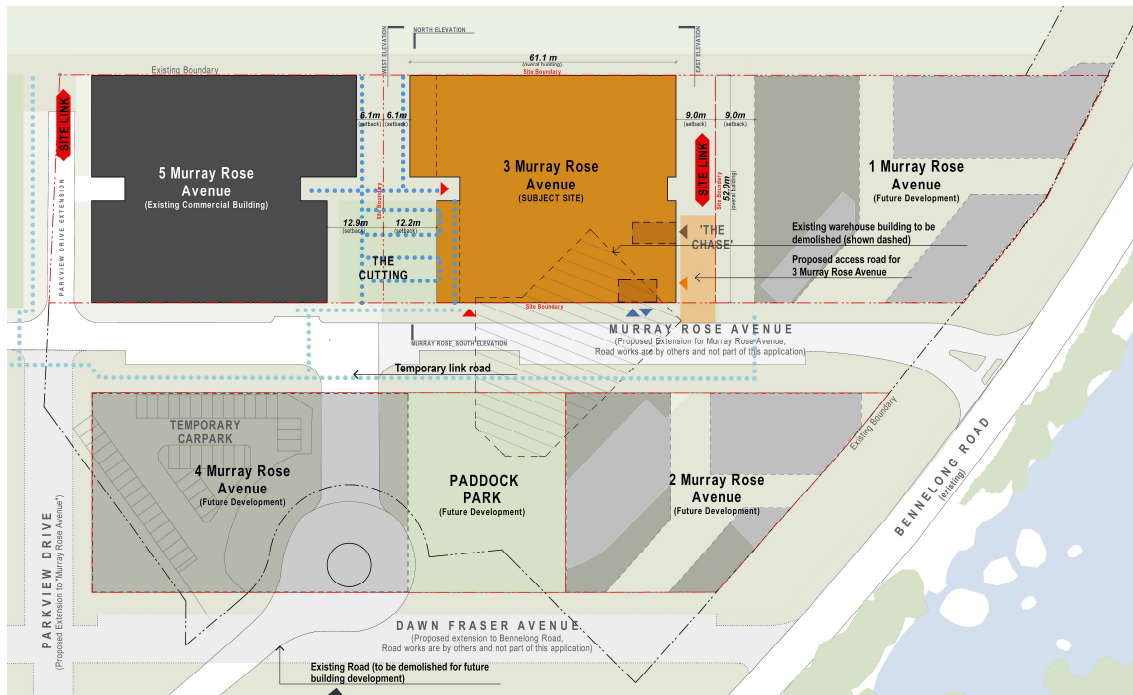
1- 5 Murray Rose Avenue Master Plan
